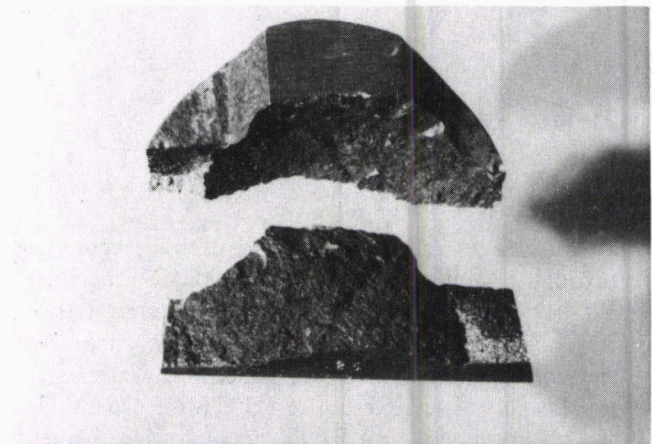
Exposed crack surface of Core 25 showing path of crack into flange plate.
